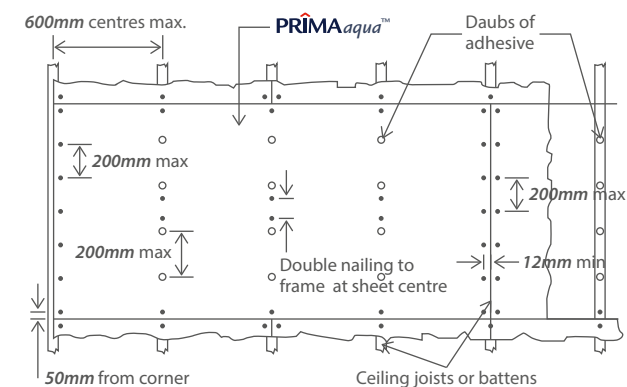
PRIMA^{aqua}™ Ceiling - Fastener and Adhesive Fixed
